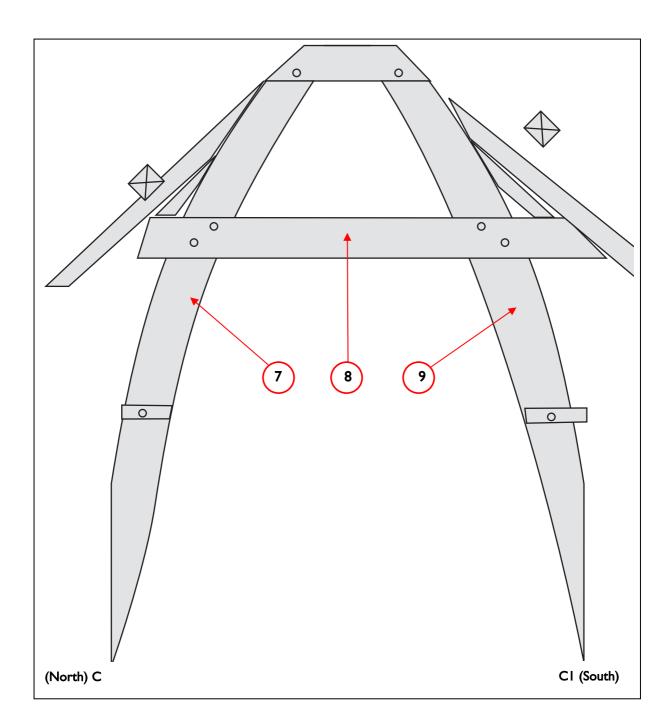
Schematic section of truss C-CI to show sampled timbers (viewed from the west looking east)
